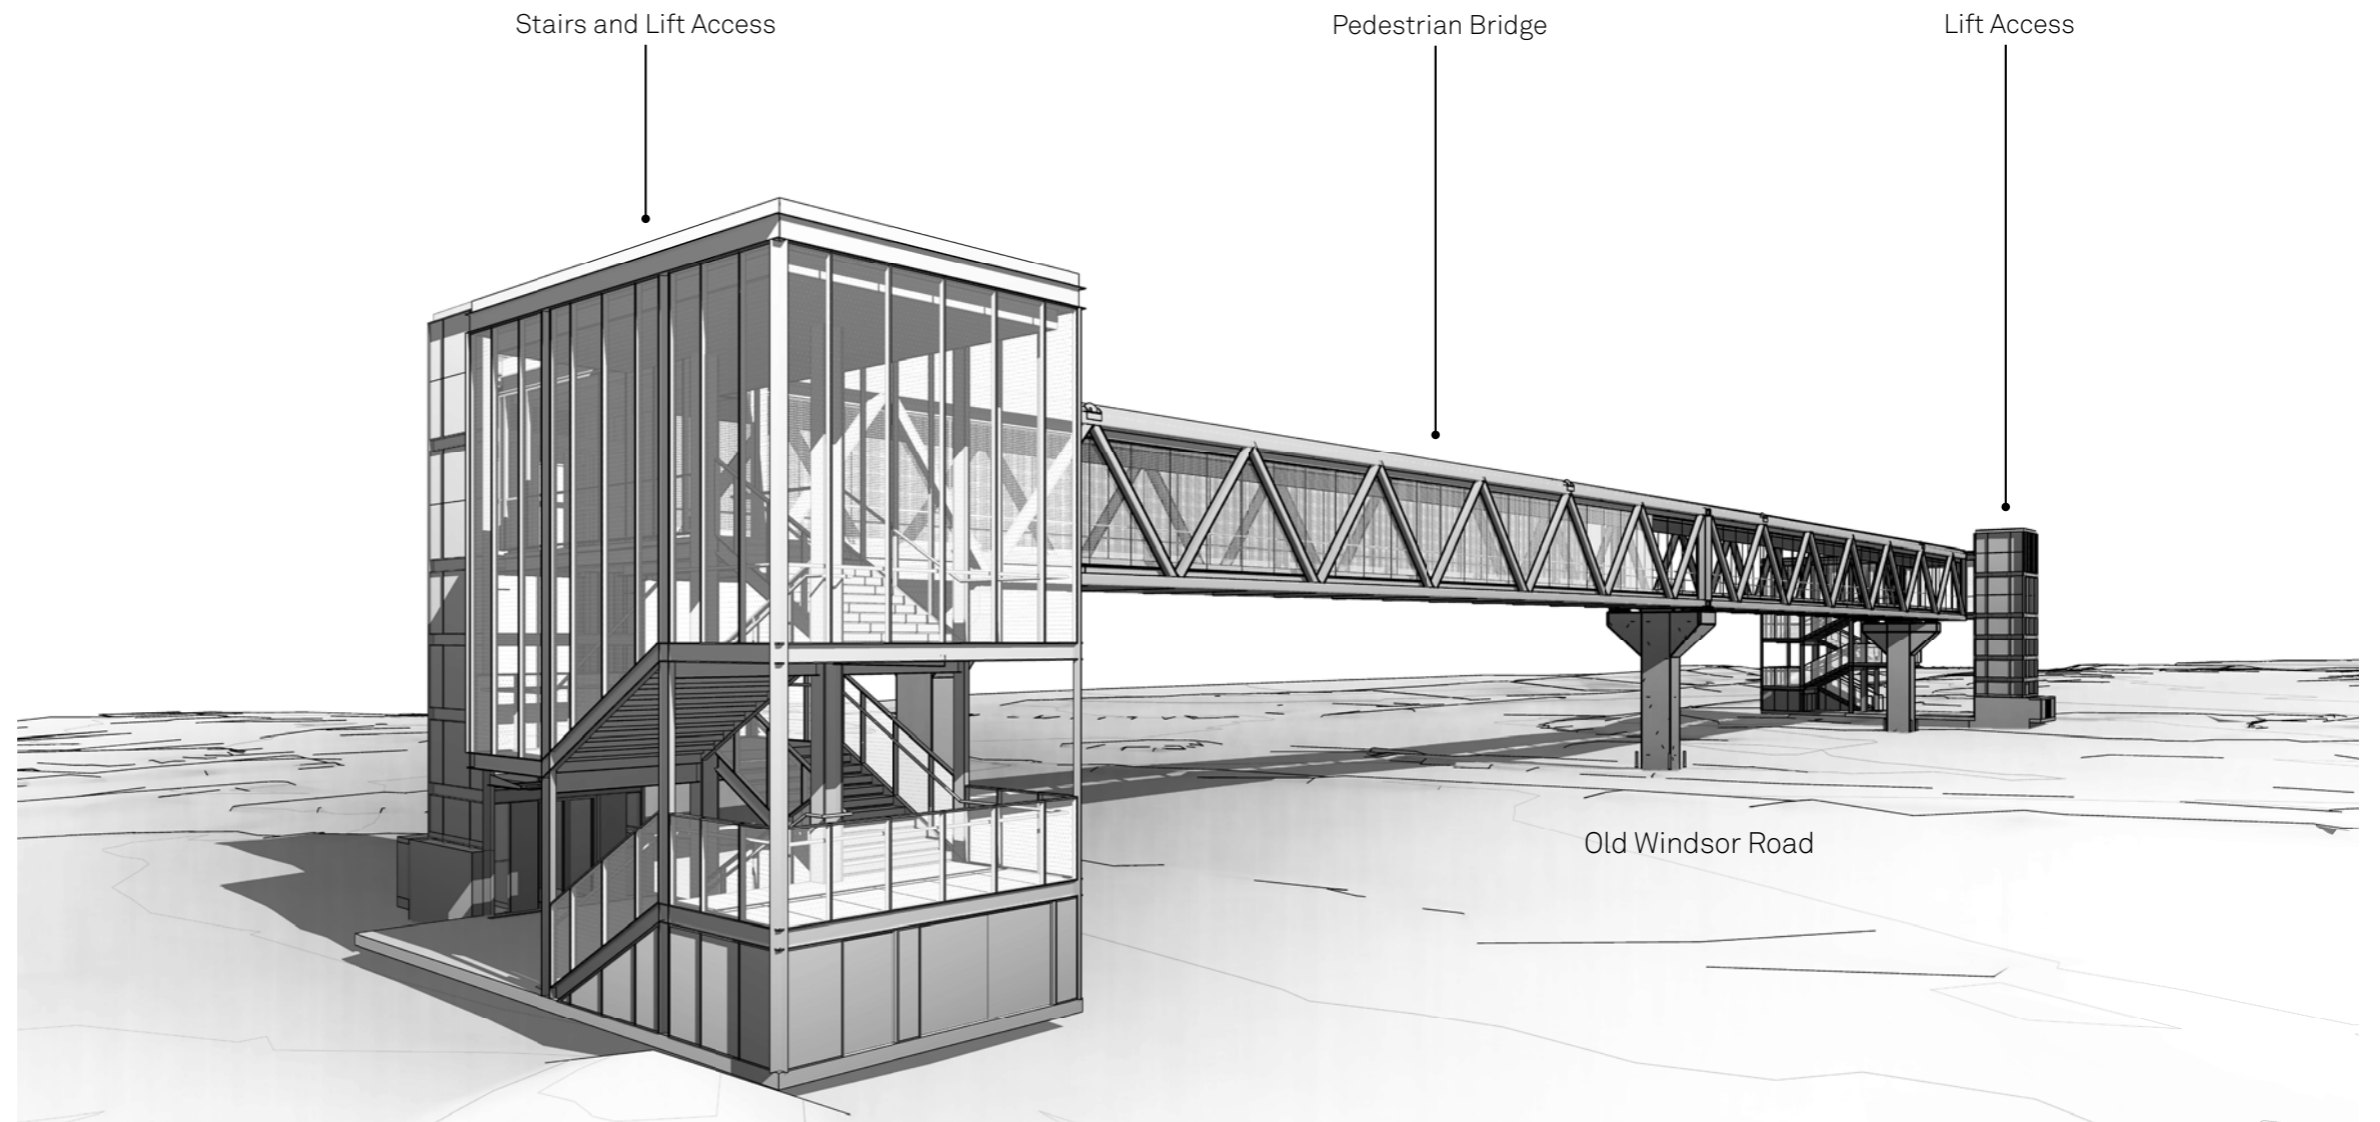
KVE\_Kellyville Station Pedestrian Bridge crossing Old Windsor Road. Source: HASSELL.
